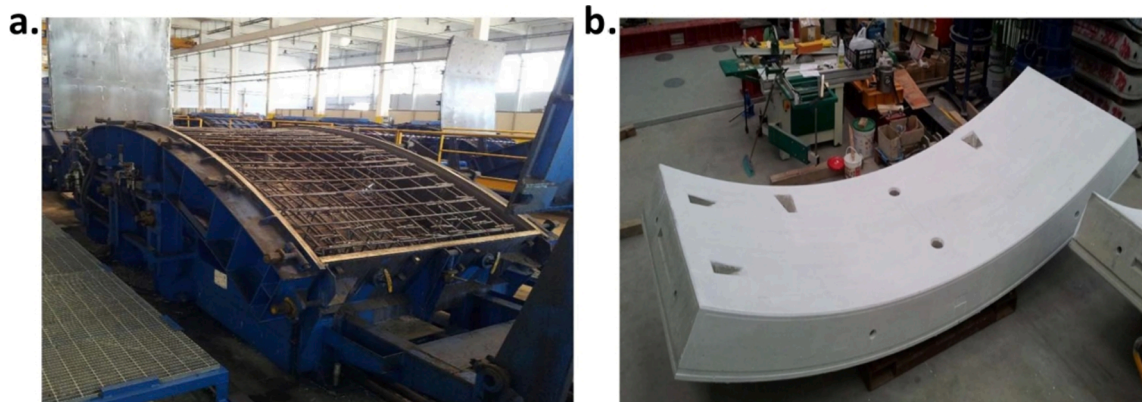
Metro segment: (a). reinforcing steel cage before casting; (b). after casting [12].
